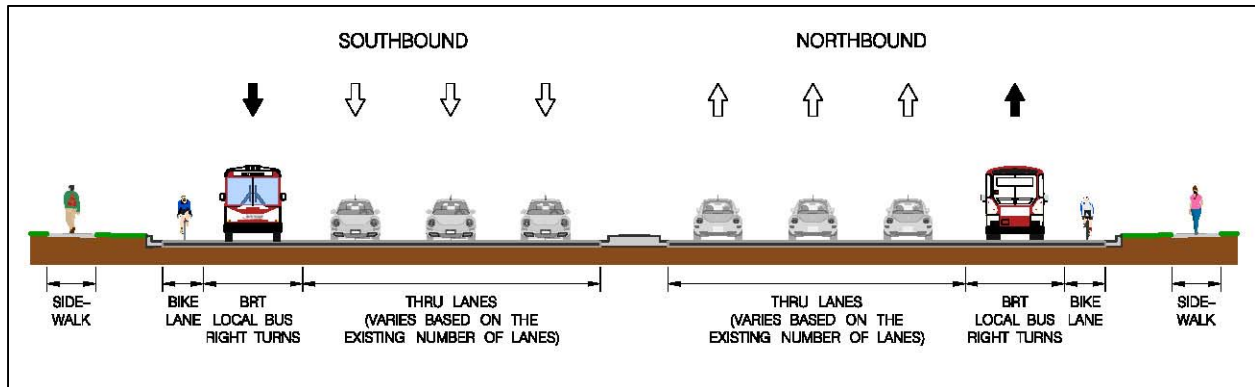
Alternative 4C - Section 3: Rockville Town Center
